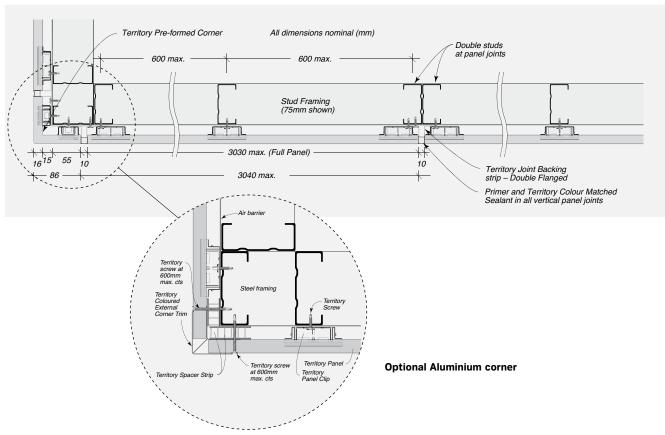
Typical Territory System Cross Section for Steel Framing – Elevation
